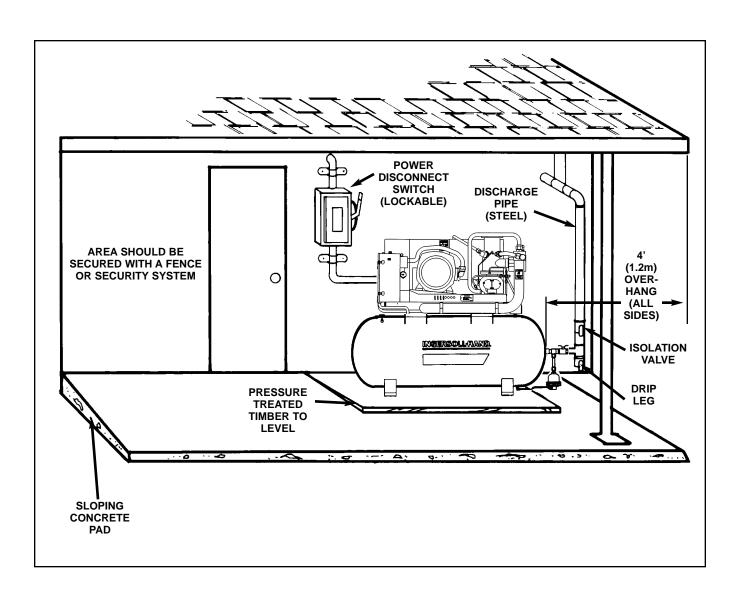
TYPICAL OUTDOOR SHELTERED INSTALLATION 35°F (2°C) AND ABOVE
